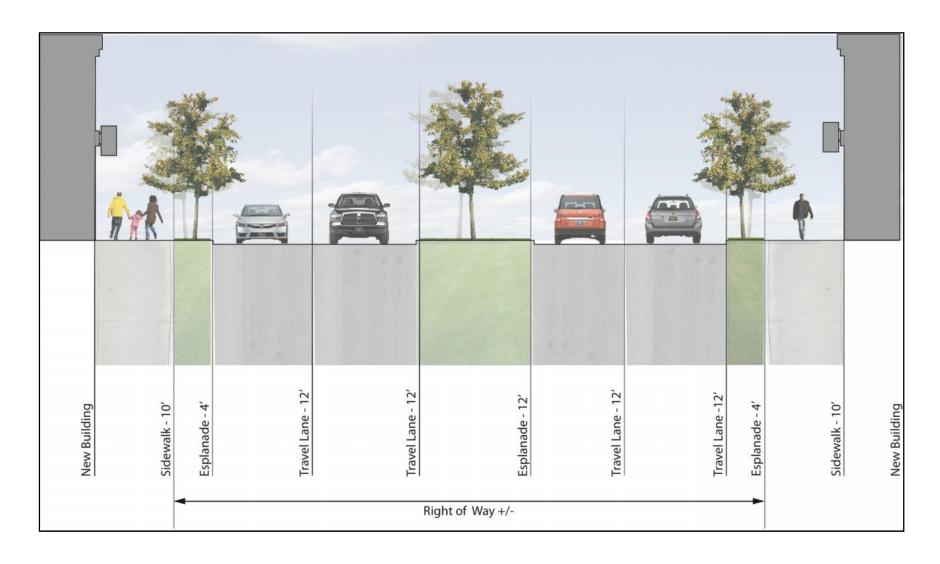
Conceptual Roosevelt Trail Cross-Section in Select Locations (see plans in Appendix A for recommended location of esplanades)
